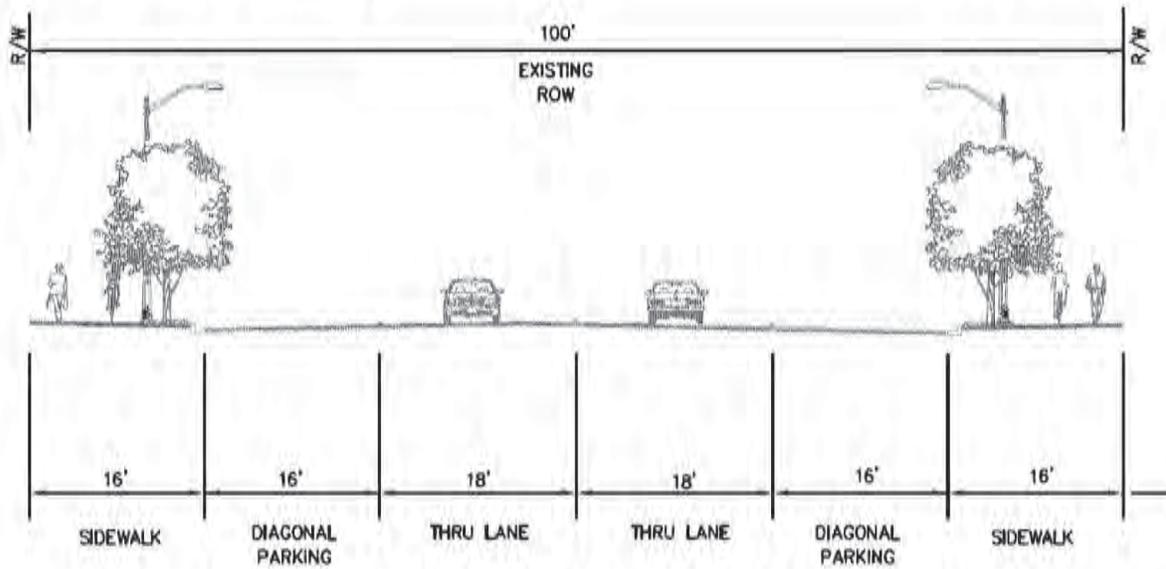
Proposed Cross Section, 3rd Avenue With Diagonal Parking
